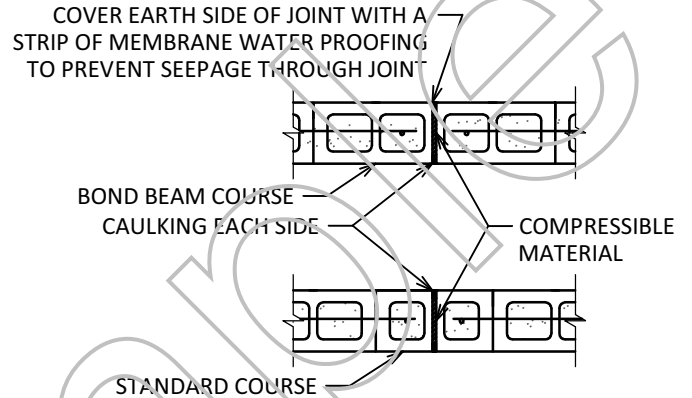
CONCRETE CONTROL JOINT DETAIL
